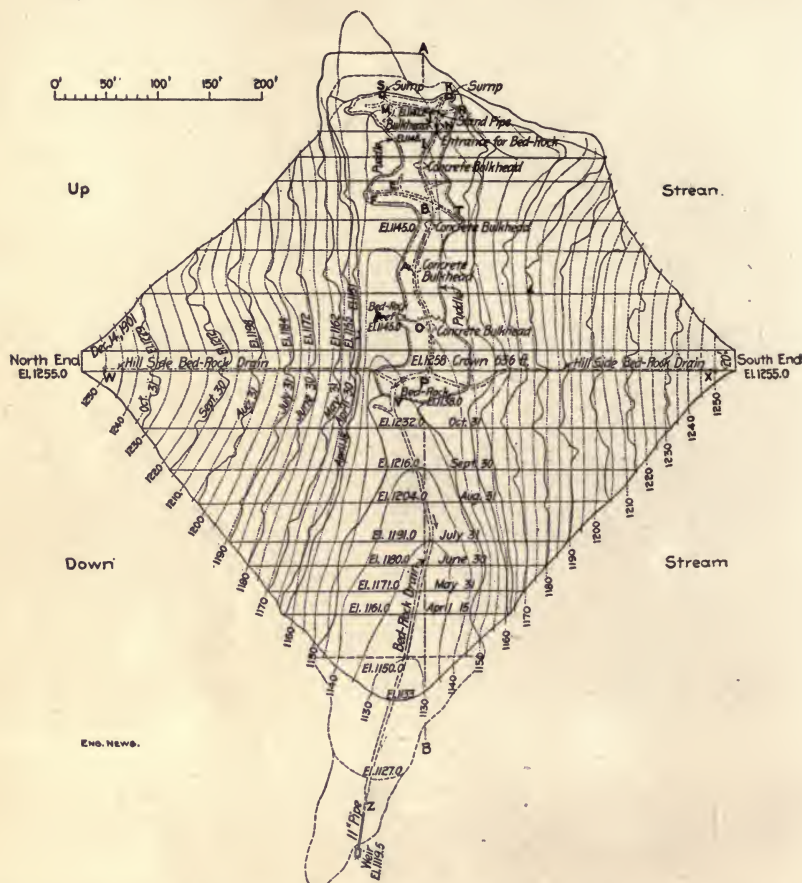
PLAN OF TABEAUD DAM, SHOWING BED ROCK DRAINAGE SYSTEM.
